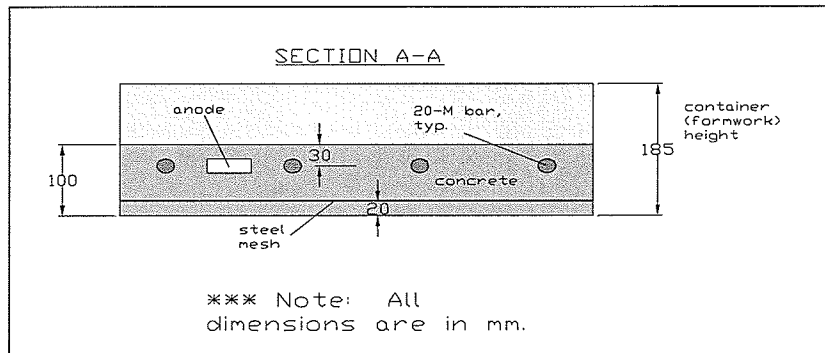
Cross-section of typical reinforced concrete slab specimen with embedded galvanic anode system
